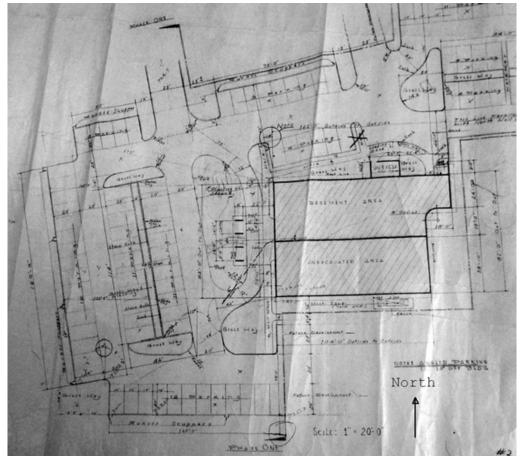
Original supper club and parking plan, 1966 (Building plans)
